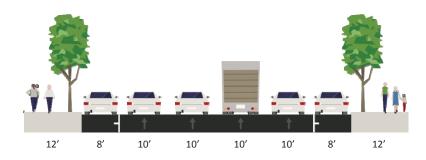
Kennedy Boulevard Typical Cross-Section, between Florida Avenue and Marion Street
